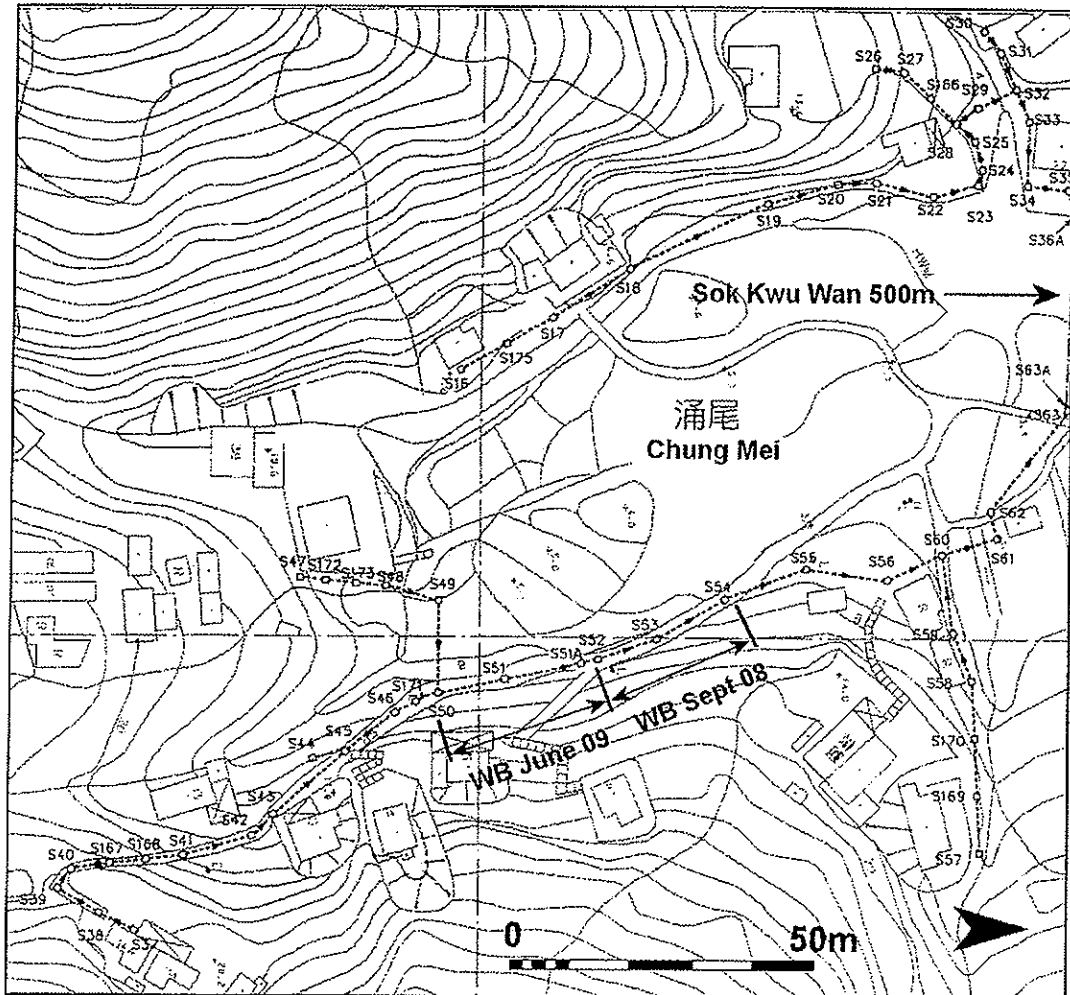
Plan showing location of sewer trench alignment at Chung Mei, with September 2008 and June 2009 watching brief areas highlighted
